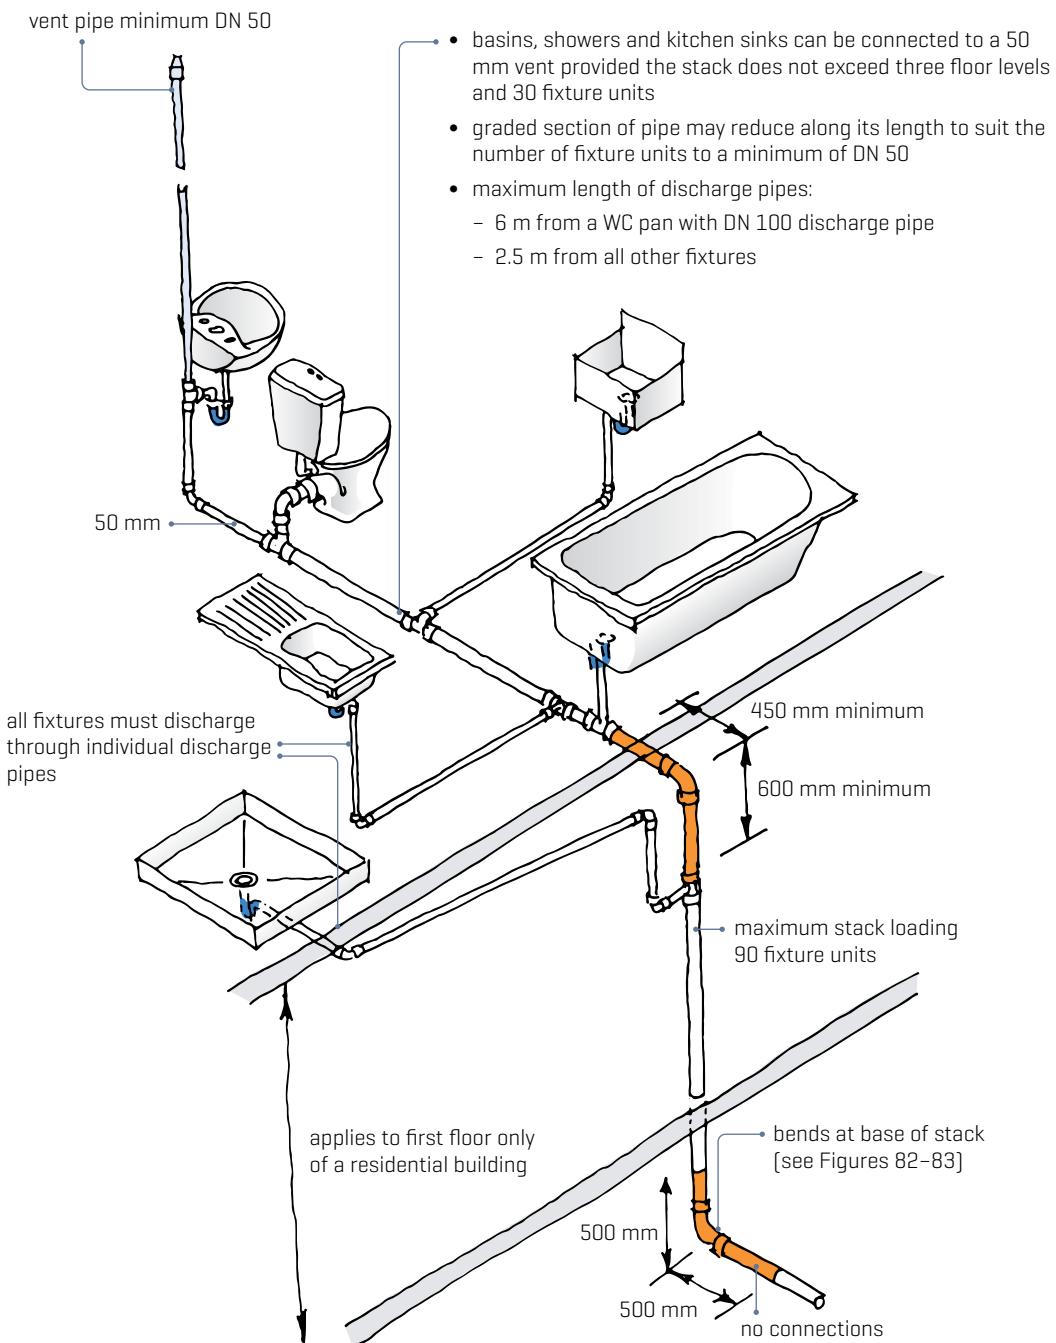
DN 80 stack with graded section at the upper floor of a residential building.
